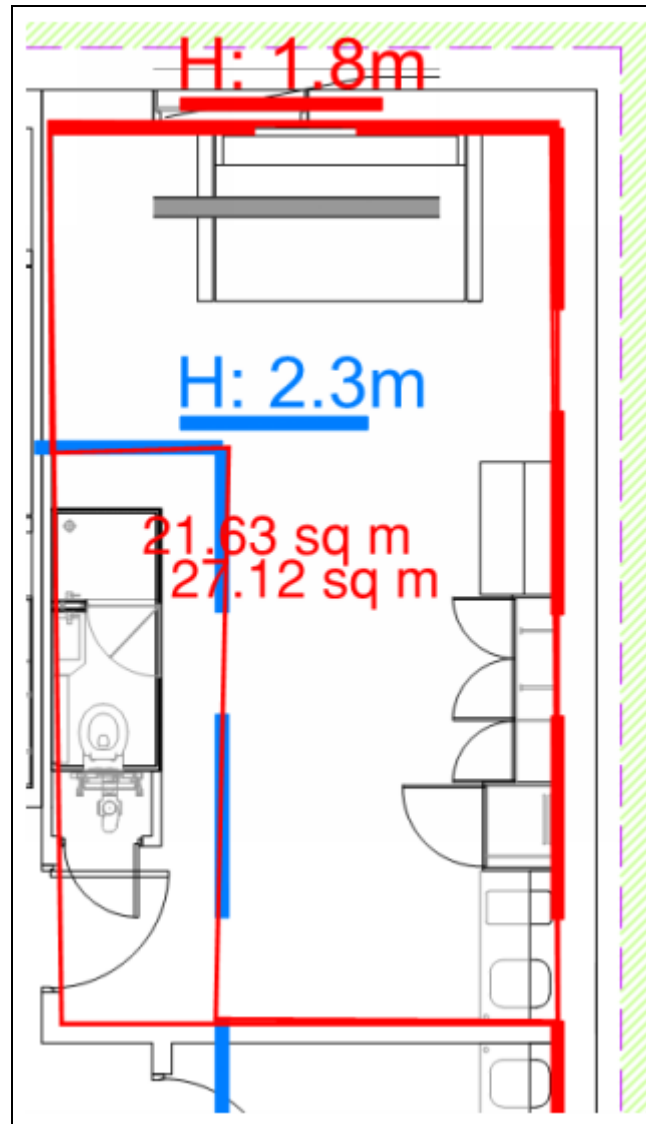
(above): Image of one of the single units, showing the overall floor area and the space within the lower ceiling height
